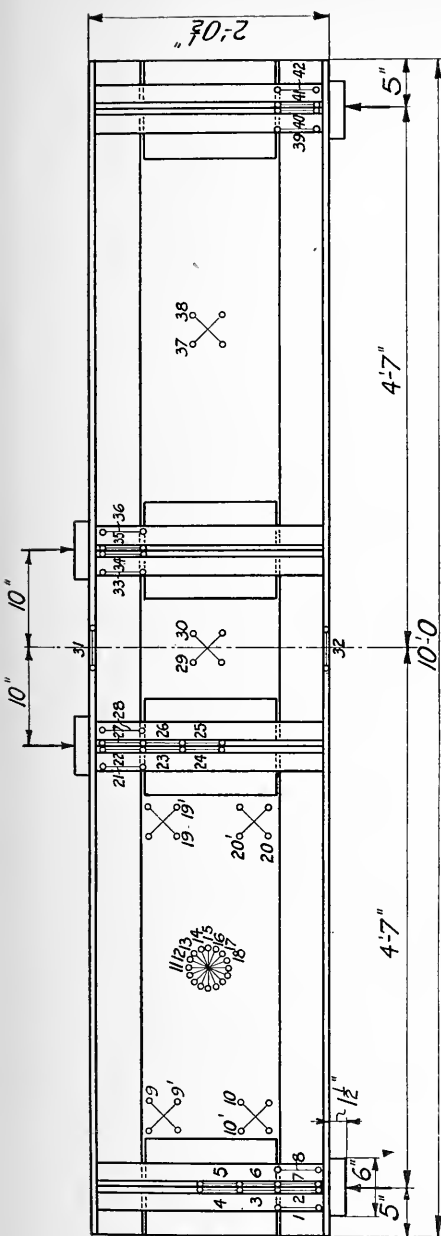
BUILT-UP GIRDERS 3 AND 8 SHOWING LOCATION OF GAGE LINES
